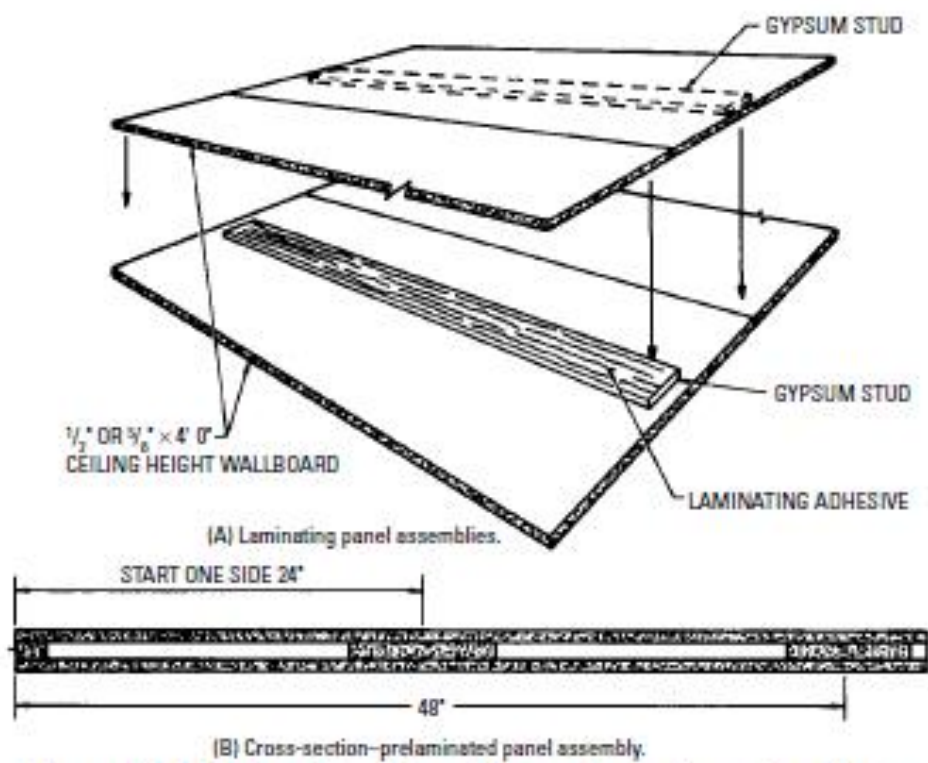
Plasterboards are laminated together with wide pieces of plasterboard acting as wall studs. (Courtesy National Gypsum Co.)
